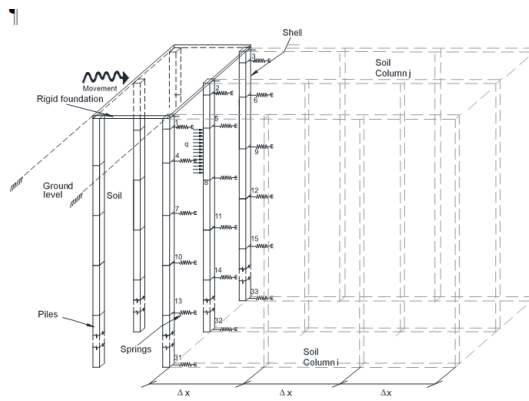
Plates and soil columns of the model and structural model of beams for the example.
